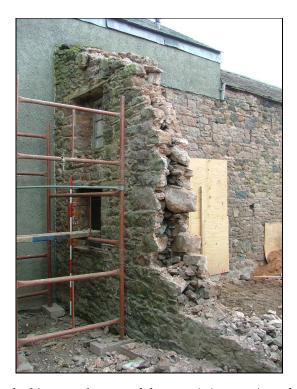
View looking north-west of the remaining section of wall of the outshut showing the render on the back wall and above the location of a former lean-to (Scale = 2m)
